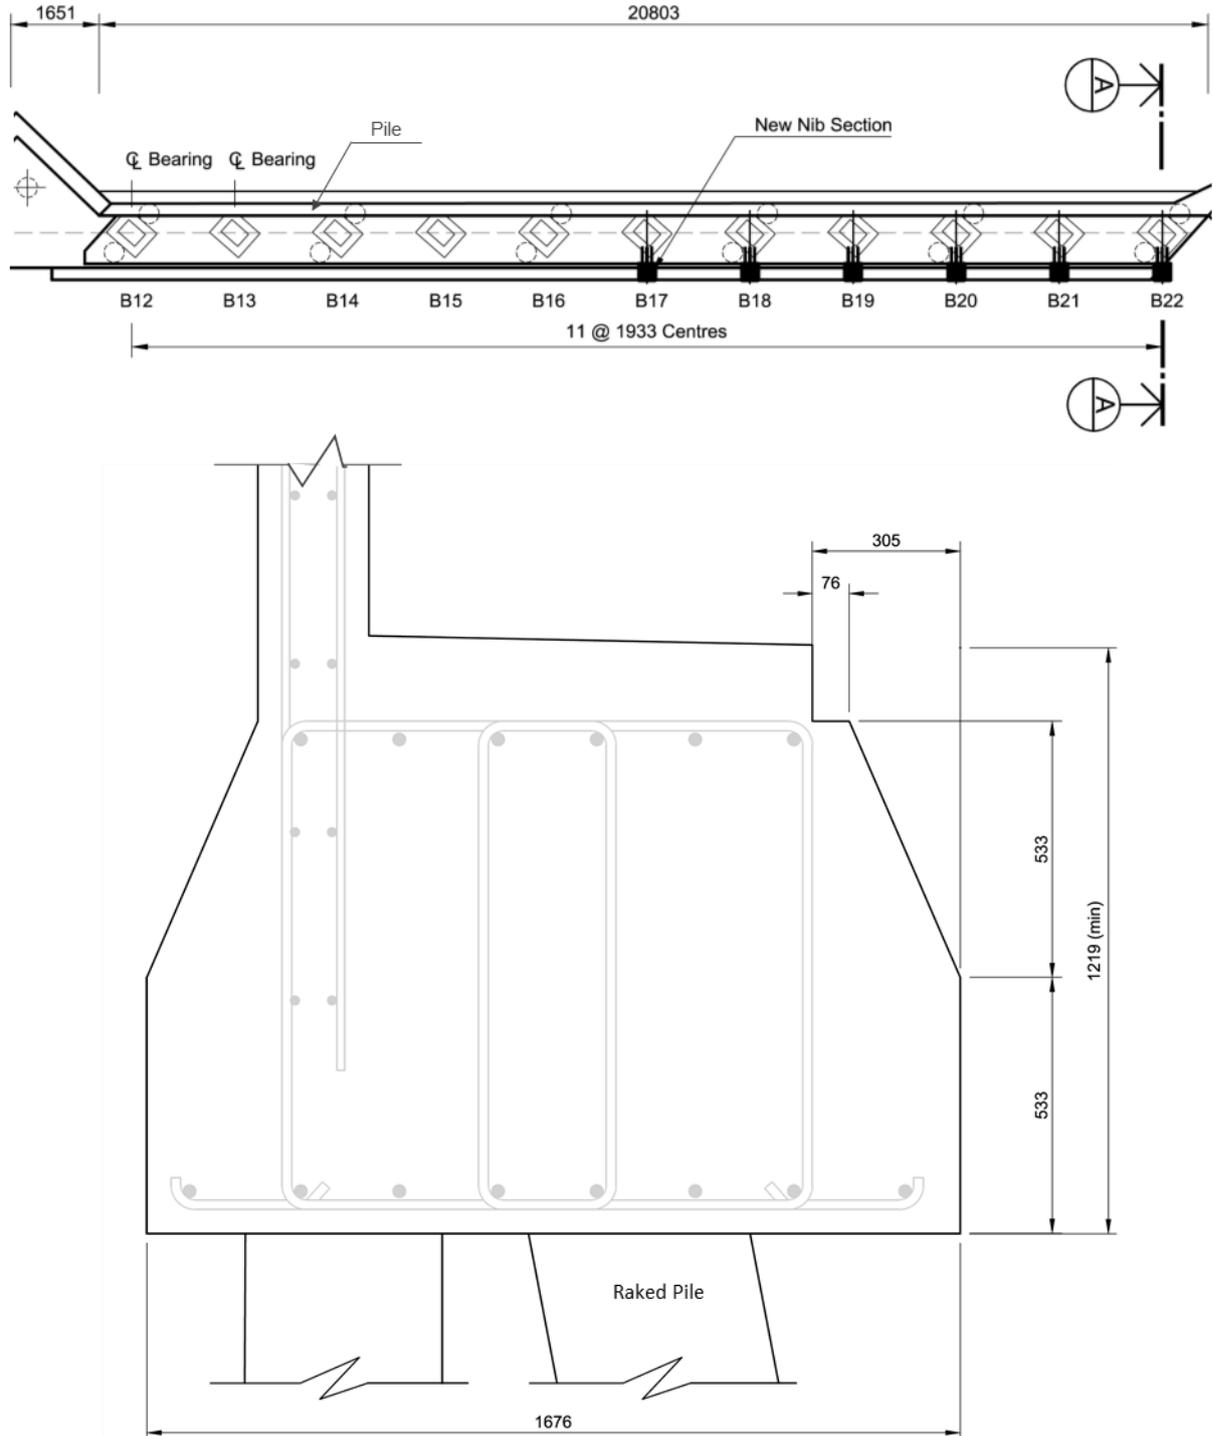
South abutment details: plan and section A-A (all dimensions are in mm).
